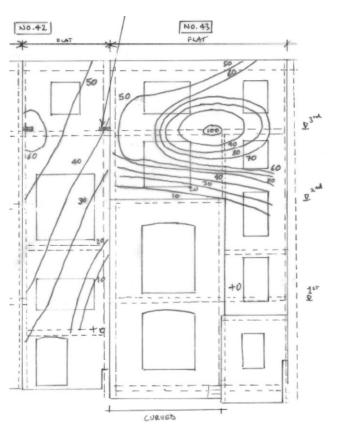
Rear elevations of Houses 42-43, showing movements of walls
